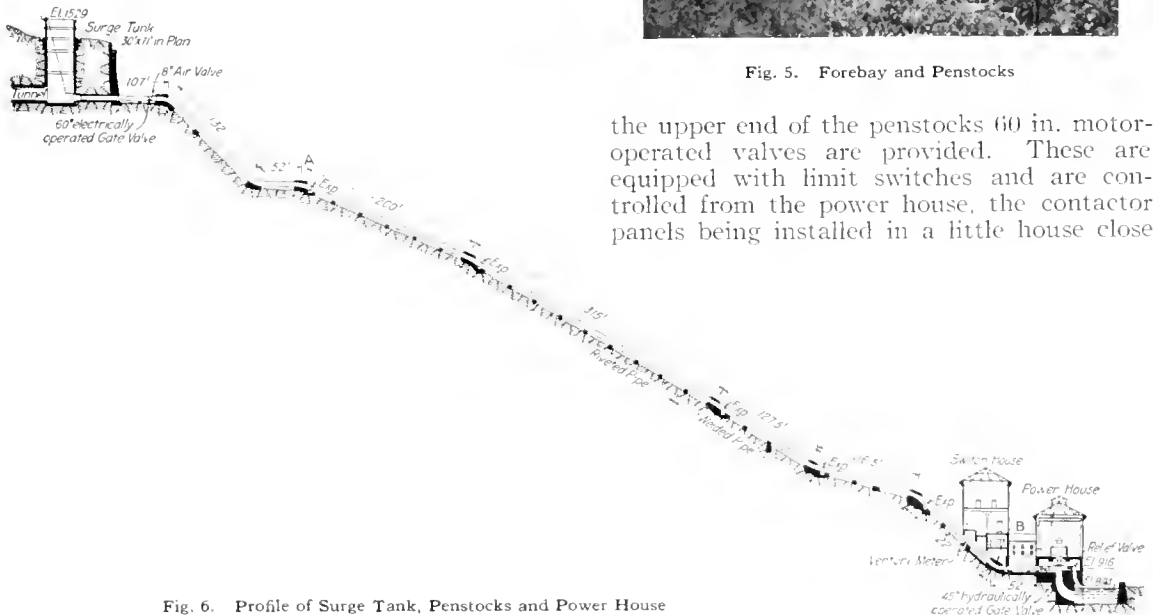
Profile of Surge Tank, Penstocks and Power House
